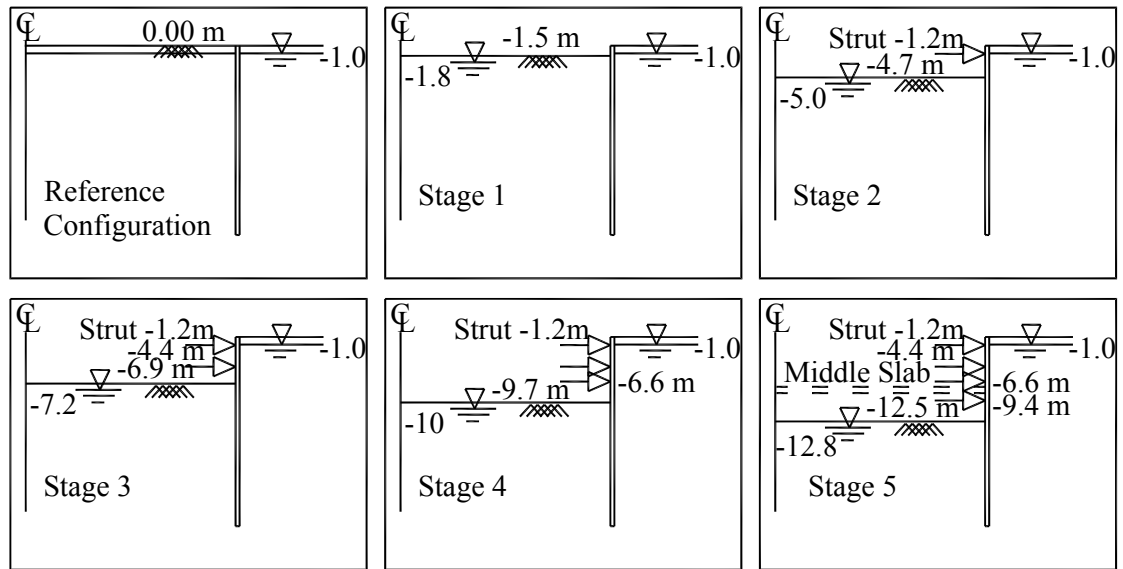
Typical cross section of the Yishan road metro station, Shanghai excavation, modified after Liu et al. (2005)
